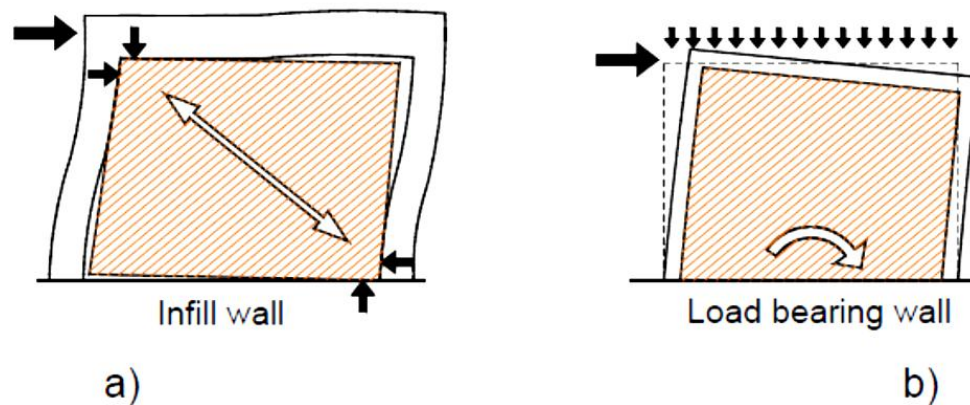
Comparison of behavior under seismic action of (a) an infill wall and (b) a confined masonry wall (Meli et al. 2011)
